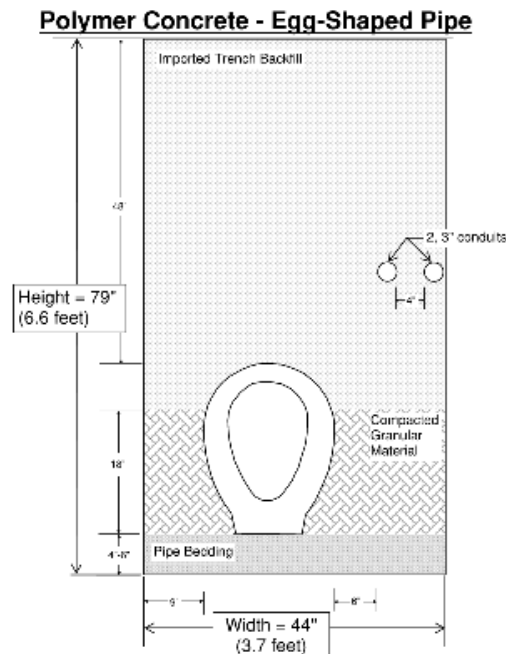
Polymer Concrete - Egg-Shaped Pipe Trench Section
